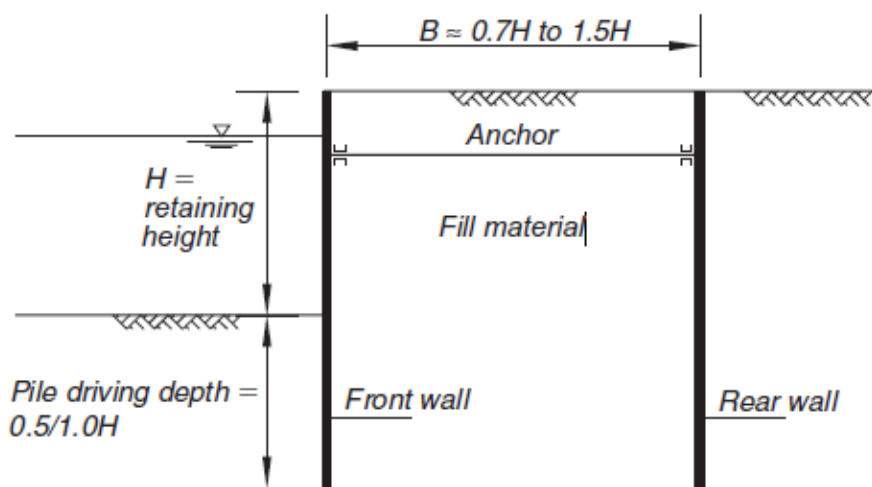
A cross-section of a basic cofferdam as an example (de Gijt & Broeken, 2013).
